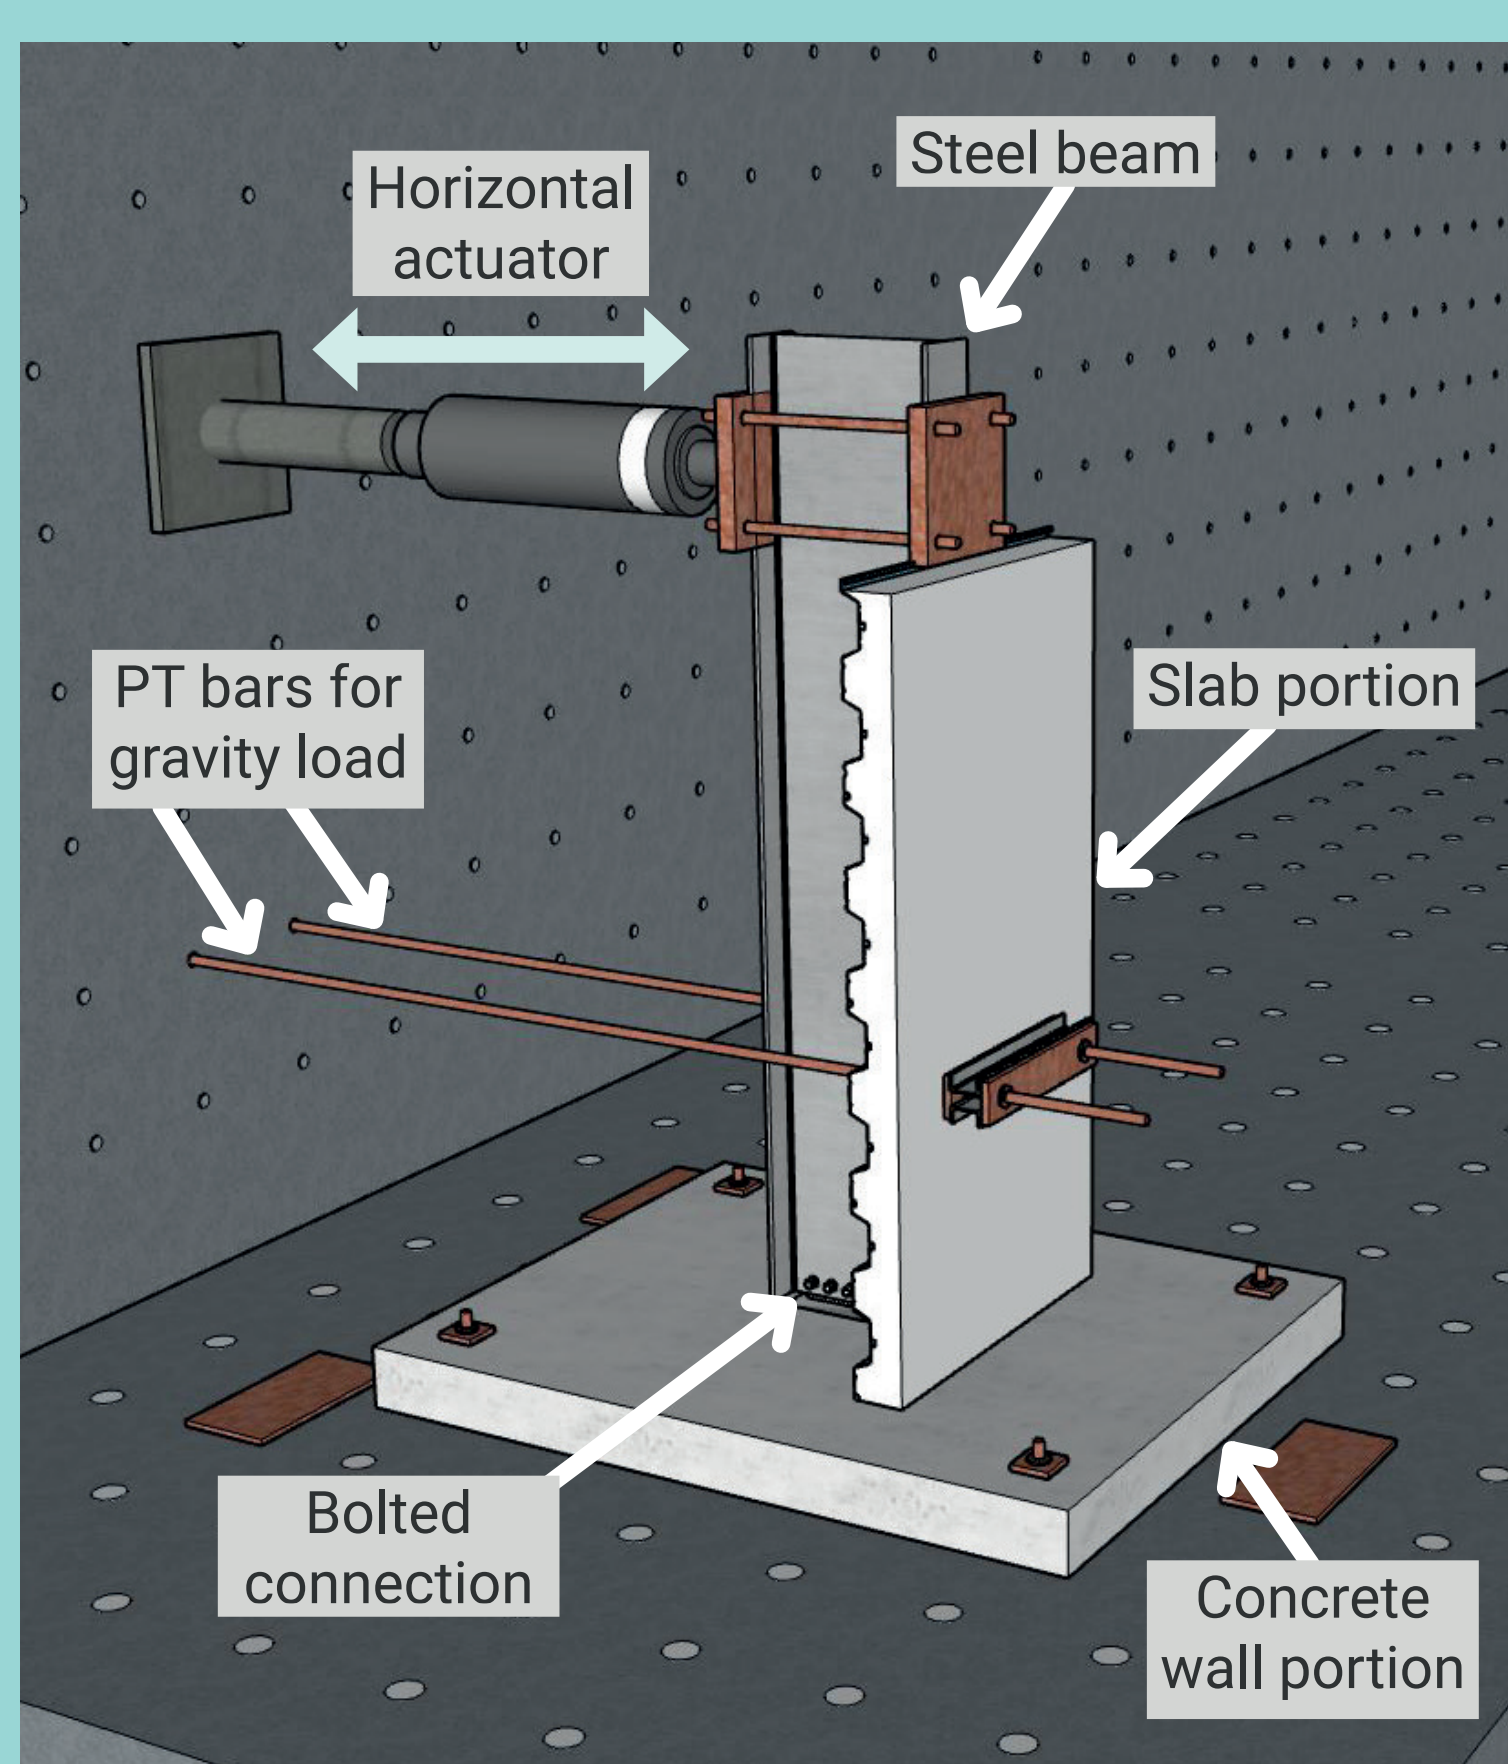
The test setup consists of a portion of a concrete wall, a steel beam and a portion of the slab. Specimens will be tested horizontally (i.e. the wall will lay flat on the strong floor).
